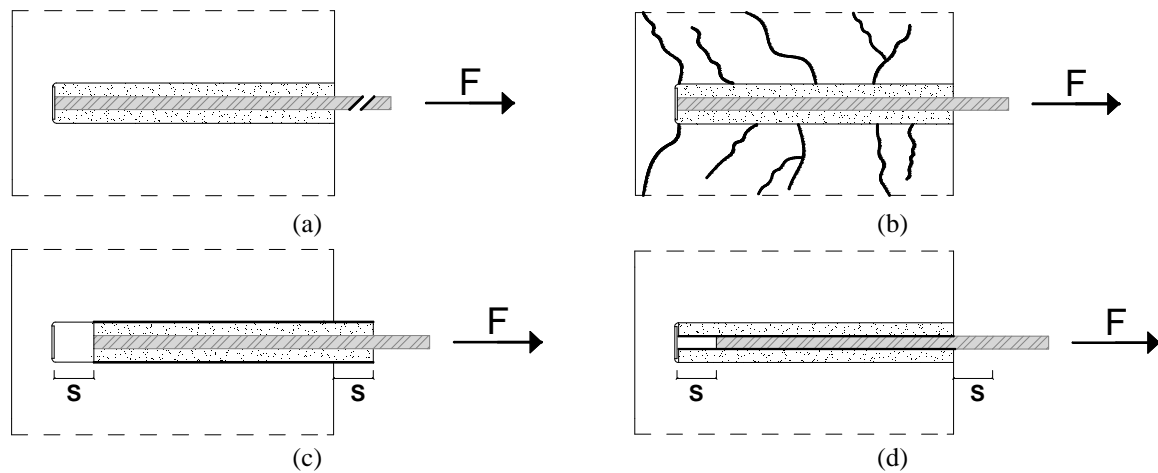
Possible failure mechanisms in anchoring systems: (a) Steel failure; (b) Masonry cone failure; (c) Sliding failure along the outer interface; (d) Sliding failure along the inner interface.
